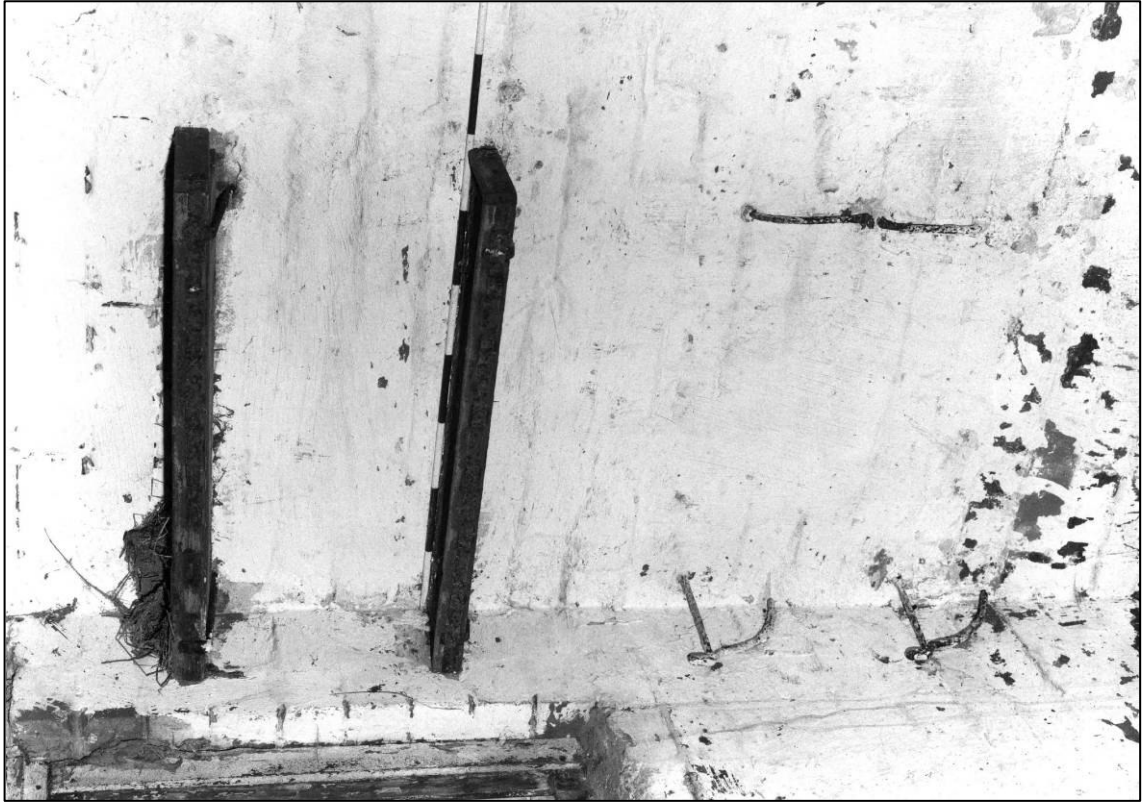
Building N1, interior east cell, fittings to S wall, looking SE (photo 2/7) (top to left).
